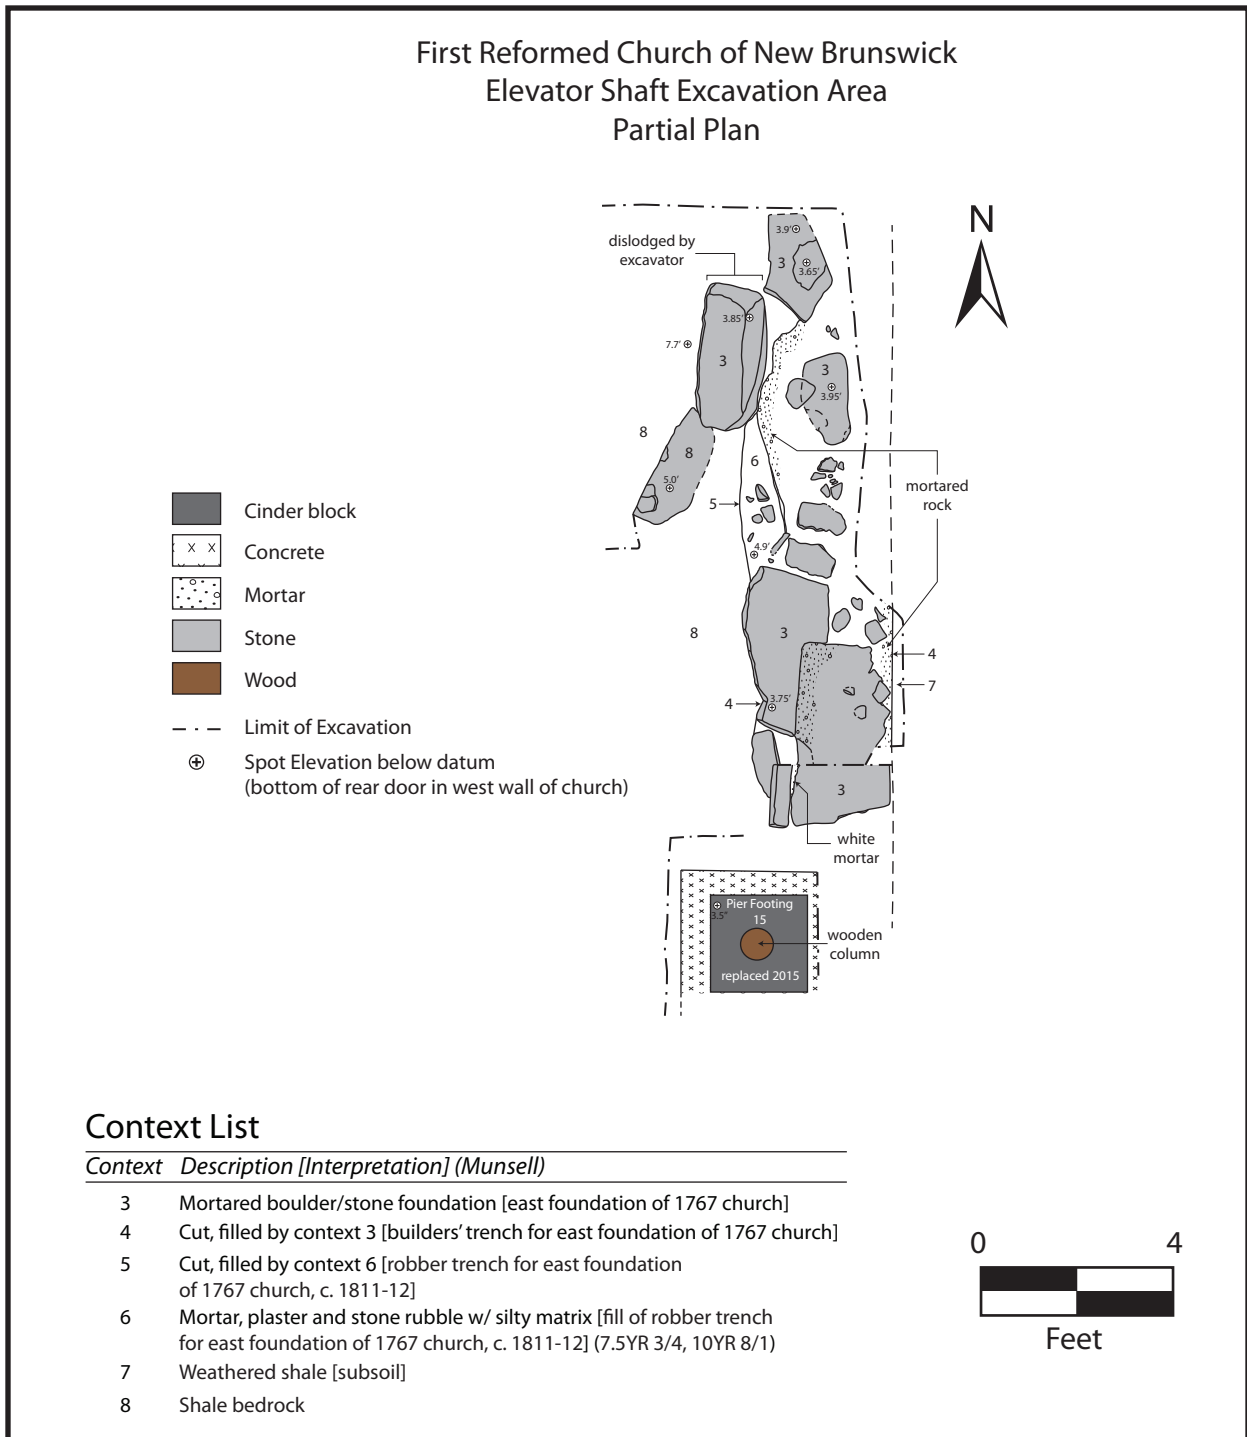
Church Interior, Elevator Shaft Excavation Area, Partial Plan.
